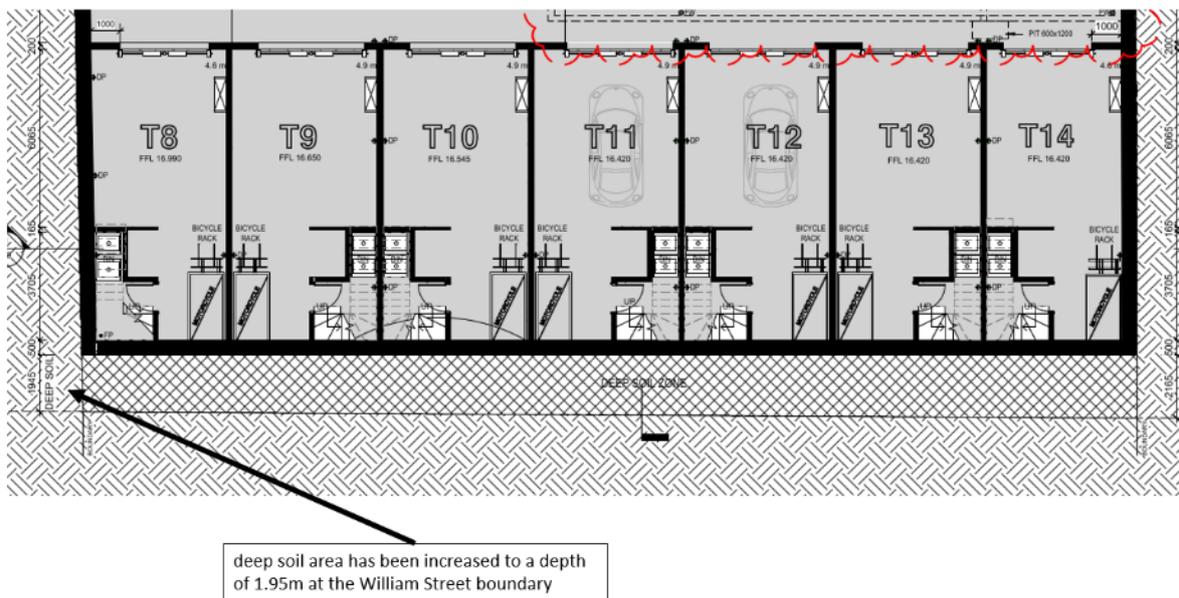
Extract from basement drawing, showing 1.95m of deep soil at the William Street boundary
